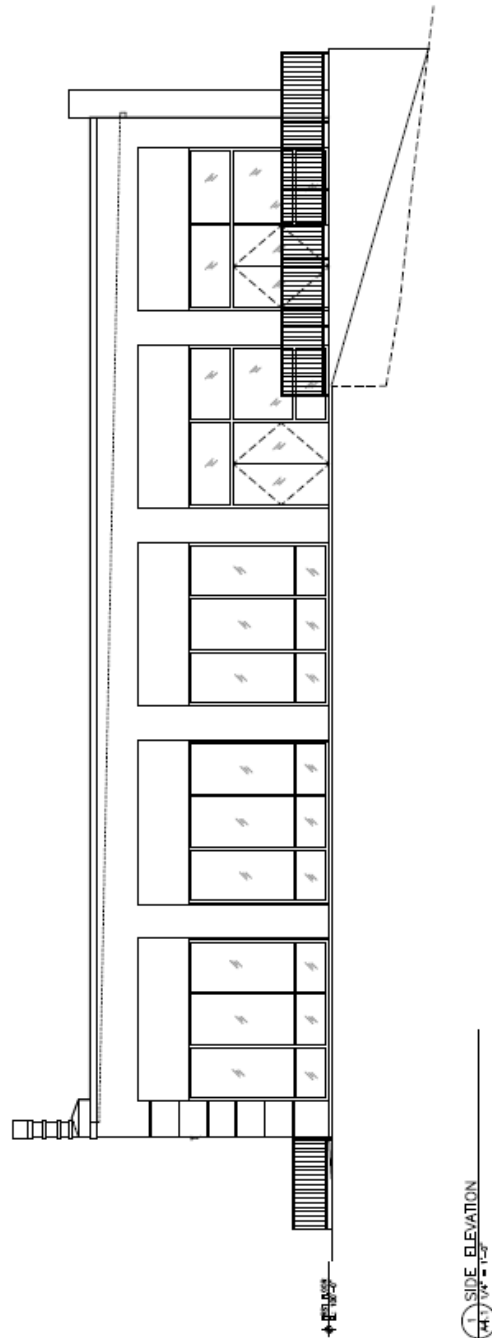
EXHIBIT F: ARCHITECTURAL ELEVATIONS (EAST SIDE)
